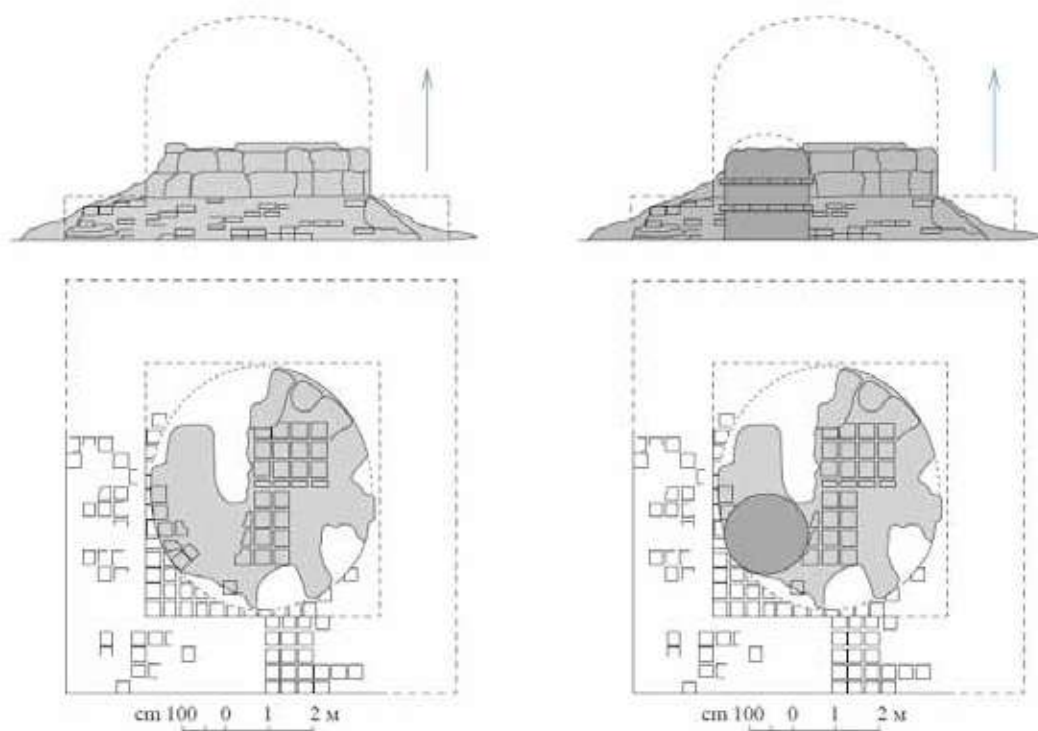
a-b. Plan and section of Airtam Buddhist stupa:
